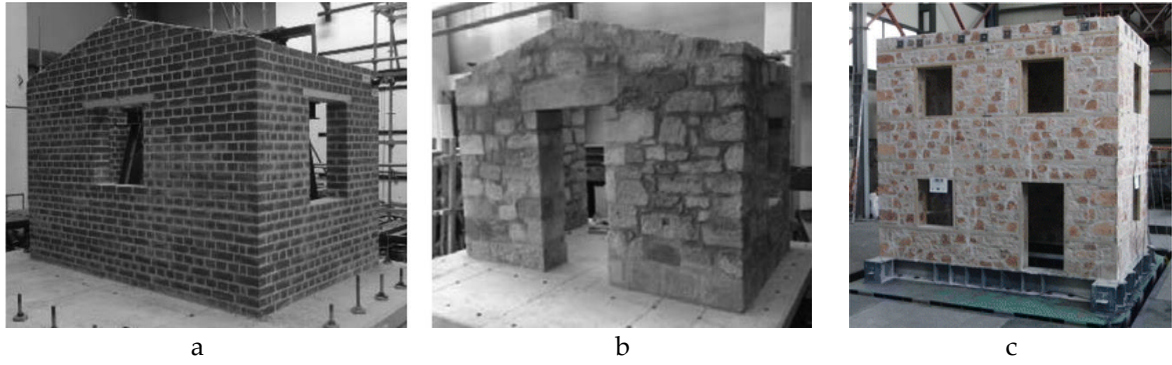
Shake table tests on U-shaped walls – (a) brick masonry, and (b) stone masonry [70], and c) two-storey timber laced masonry [71]
